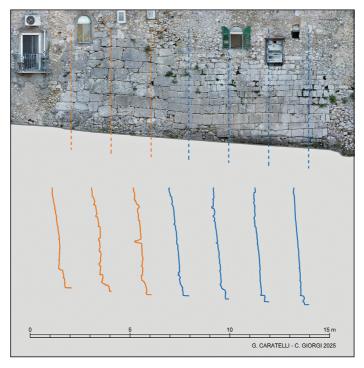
Capri, so-called Muro greco. Photogrammetric elevation and cross sections.
